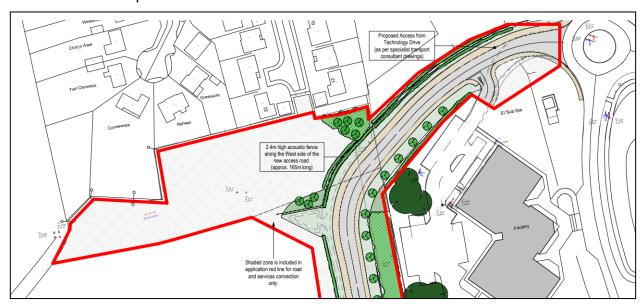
Extract of Plan Showing relationship of access road To Island Farm Close and Island Farm Road
